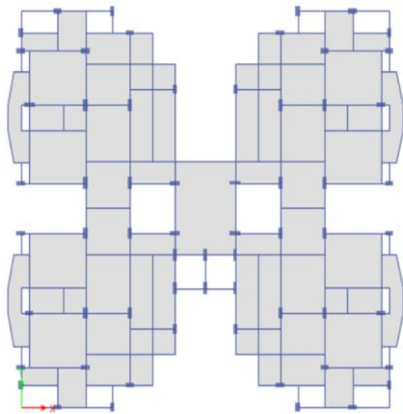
Layout of typical floor of Aster-2 in ETABS
